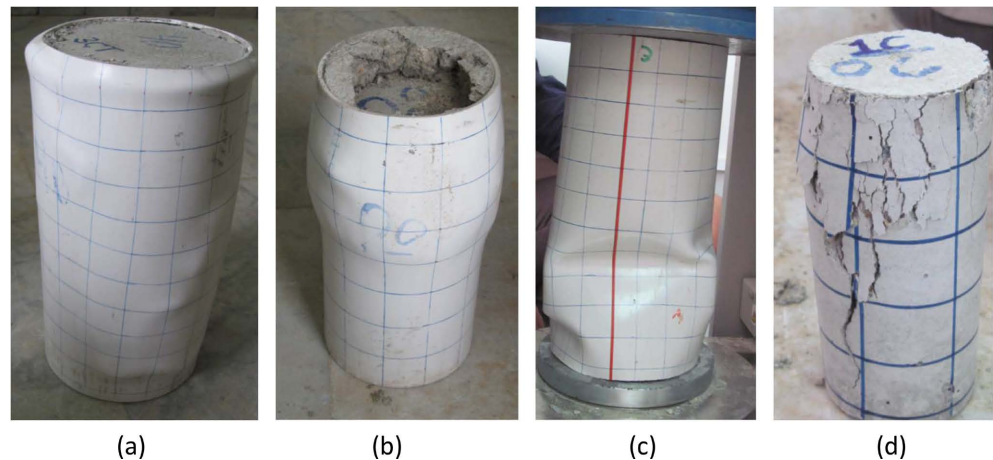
The typical failure modes of (a) full loaded CFPT, (b) partial loaded CFPT, (c) unfilled hollow UPVC tube and (d) plain concrete stub columns.
